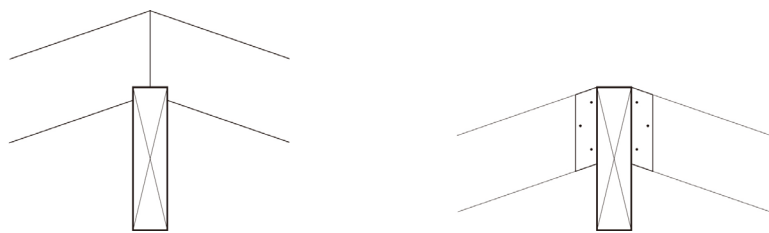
Cross section of ridge connection, drawn by author (American wood council, 2015)
